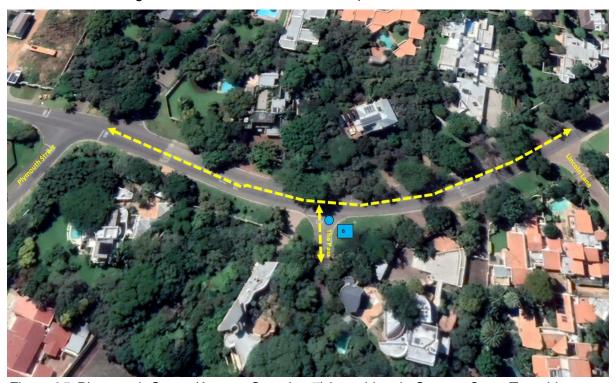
Playmouth Street (Access Crossing 7) is on Lincoln Street - Open Trenching
